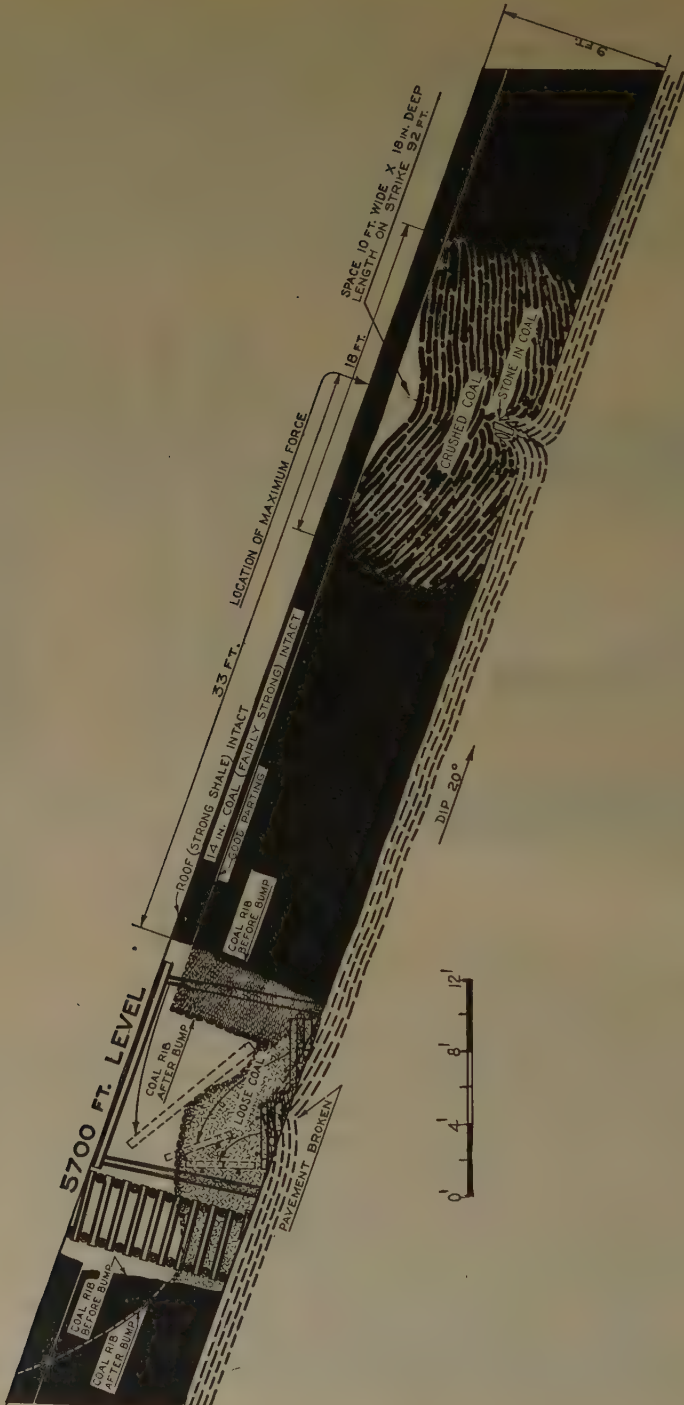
CAVITY IN COAL RESULTING FROM BUMP OF APRIL 12, 1928 (SECTION ON LINE C-D, SEE FIG. 7).
